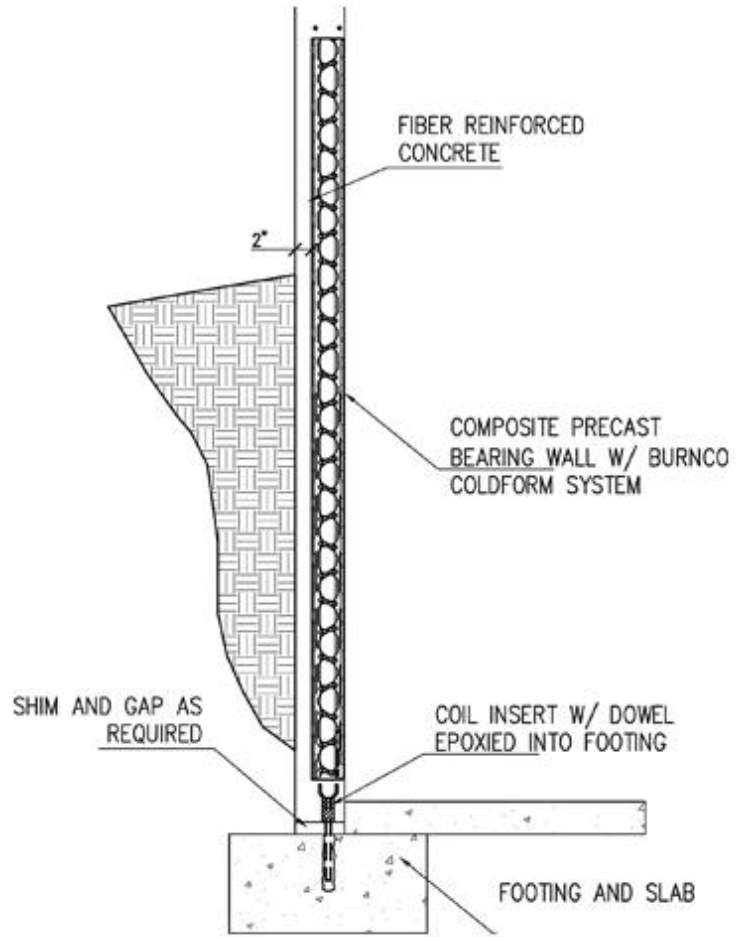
Thin shell panel as a foundation wall (“Products@www.nexcon.ca” 2011)
